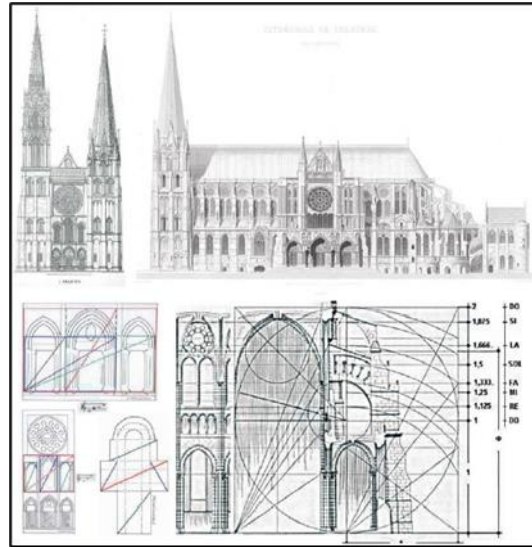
Visuals of the facade views and floor plan of Chartres Notre Dame Cathedral [7]
